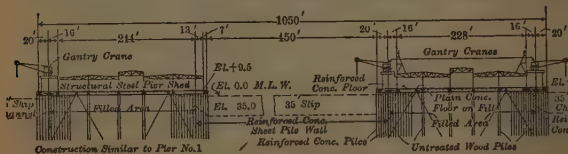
Shipbuilding. Filling Out. Navy Yard, Norfolk, Va.
